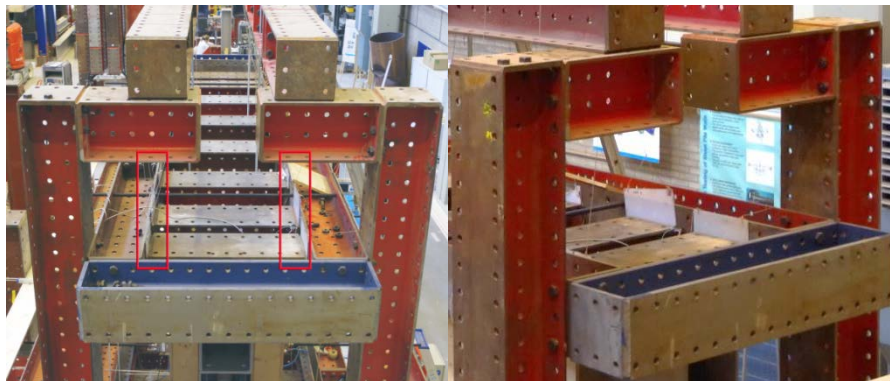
Detail of glass plates placed between the top cross beams and the transversal beam.
